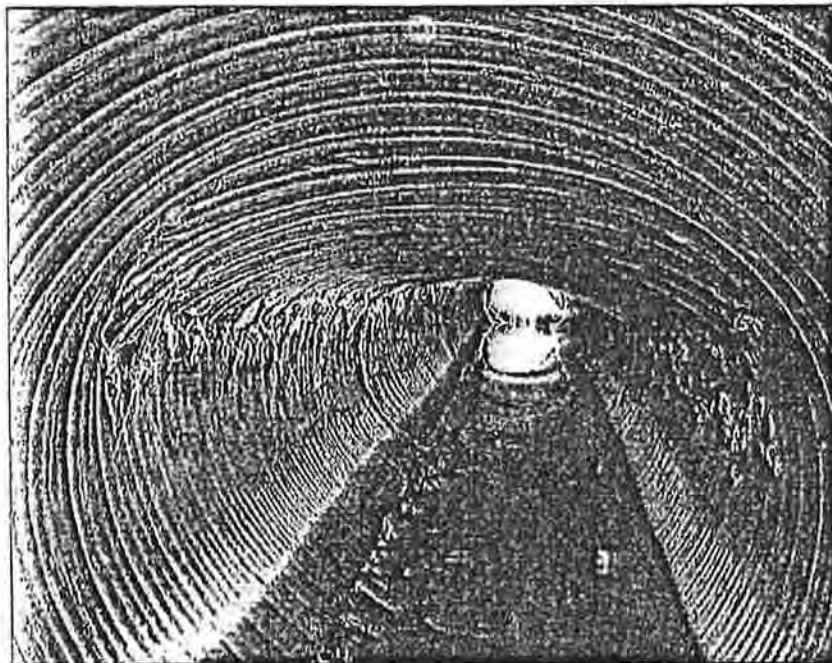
Single wall corrugated HDPE pipe experiencing wall crushing.
